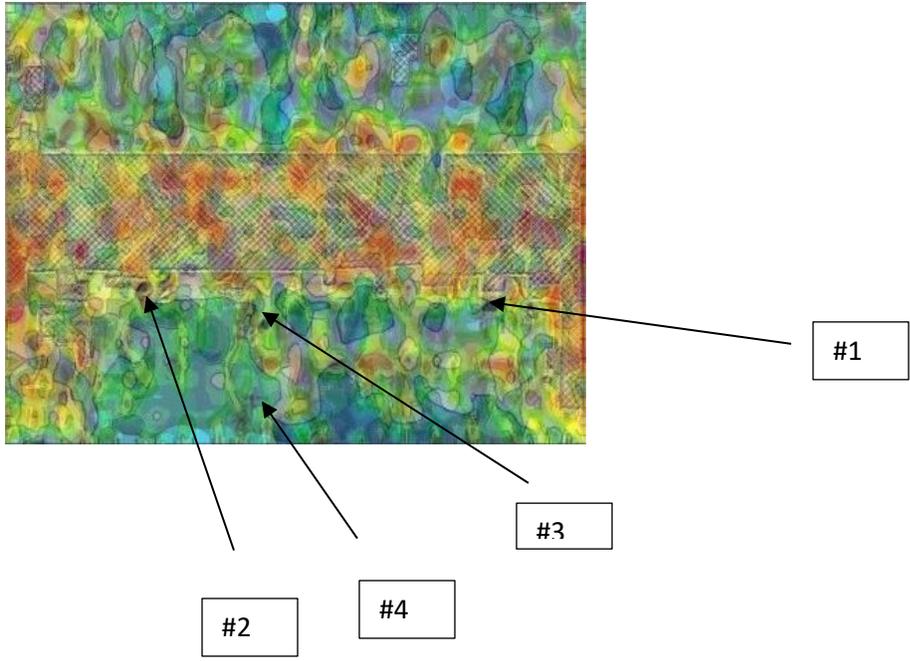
Core Samples Location in the fused image of Bridge Deck O2
